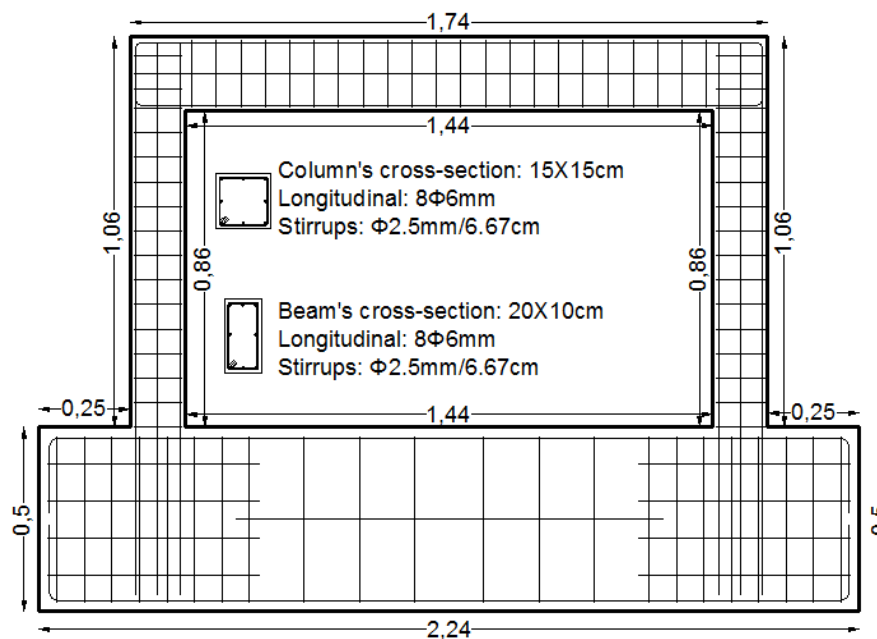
Geometry and reinforcement arrangement of the specimens (m).
